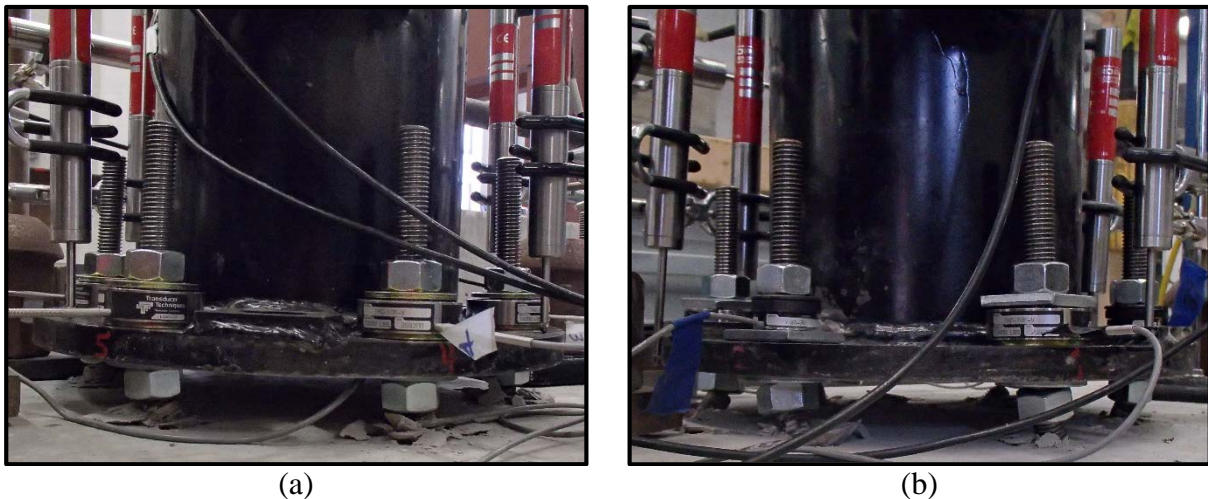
Anchor bolts in failed condition for (a) pretensioned T2-B and (b) non-pretensioned T4 ungrouted $2d_b$ base plate tests
